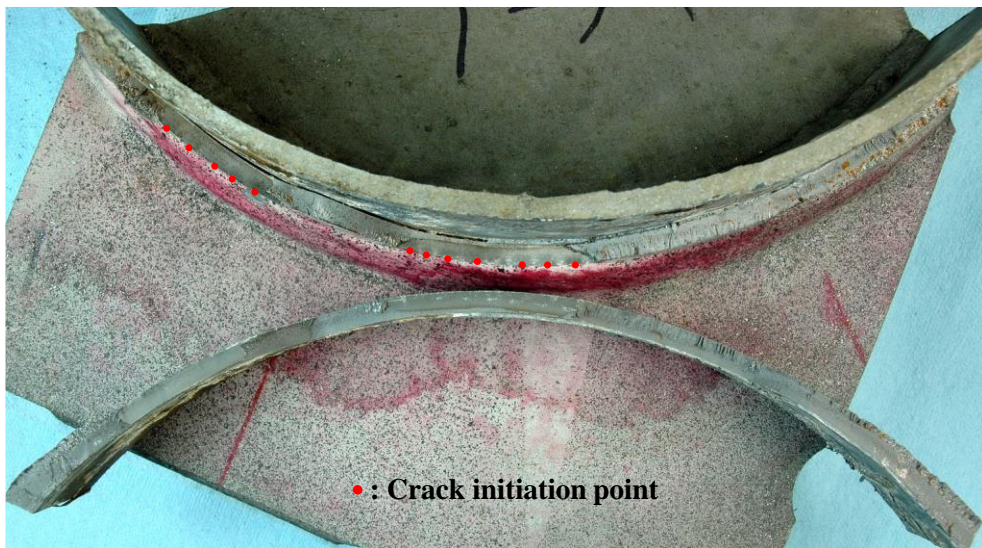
Fatigue fracture surface and identified crack initiation points in Type V-1 Pole
